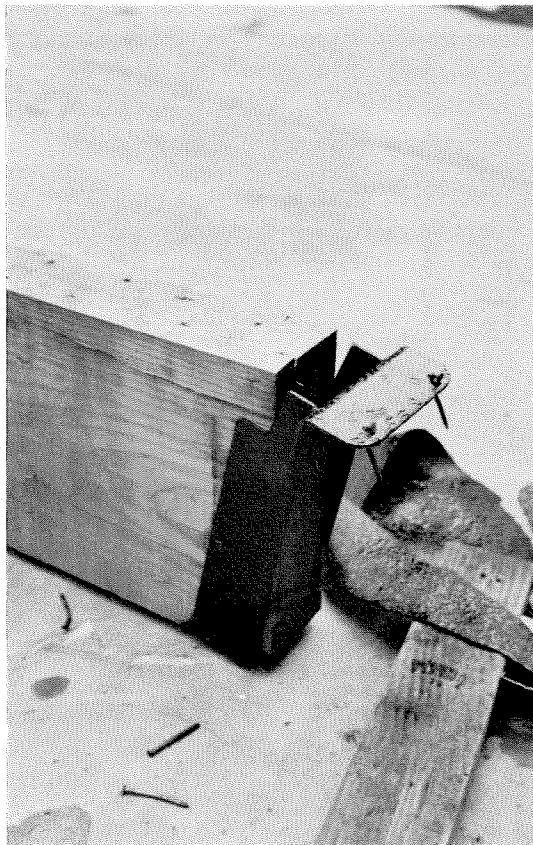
Steel connector used to fasten the 11 in x 3-1/2" purlin to the main beams and to the timber ledger on the walls. 12880 Bradley Ave.
